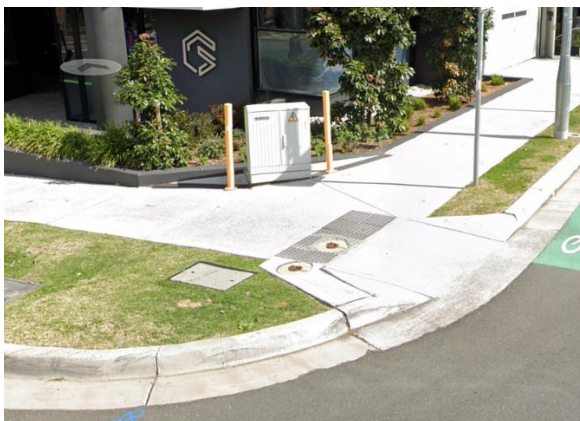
Acceptable – Corner location, but protected and setback from crossing and footpaths.
